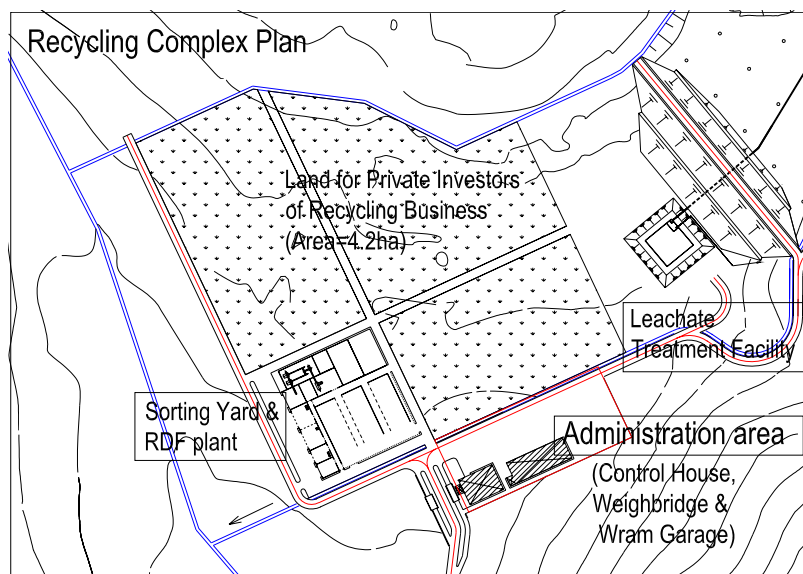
Construction Plan of Sorting Yard and RDF Production Facility in Pilot Phase
